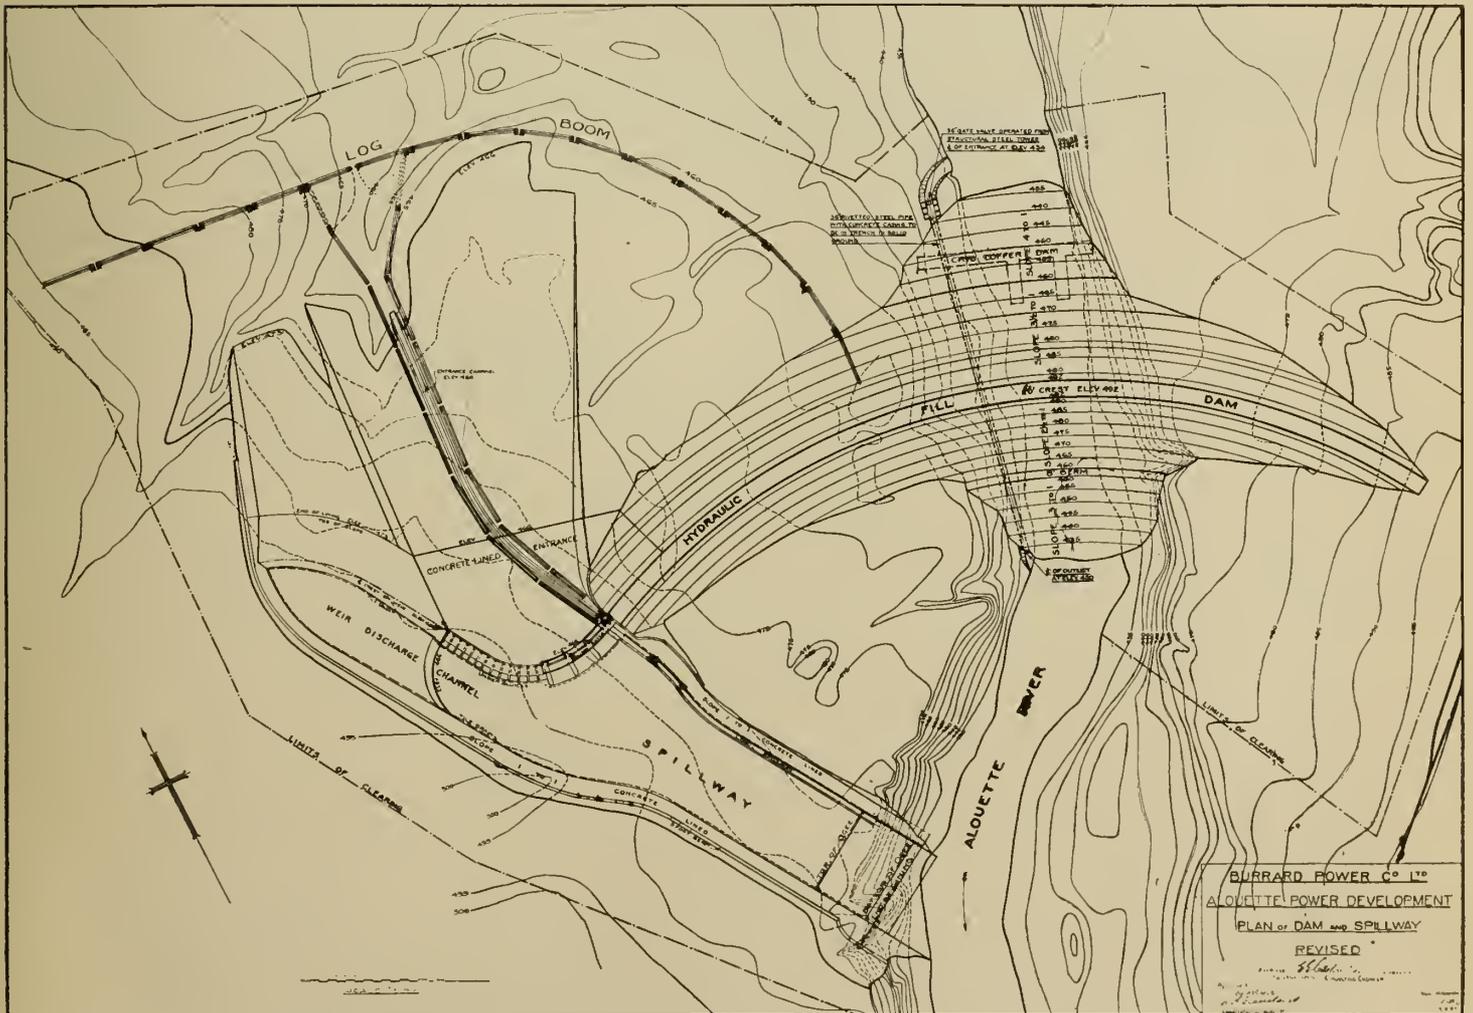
Alouette Power Development—Plan of Dam and Spillway.
